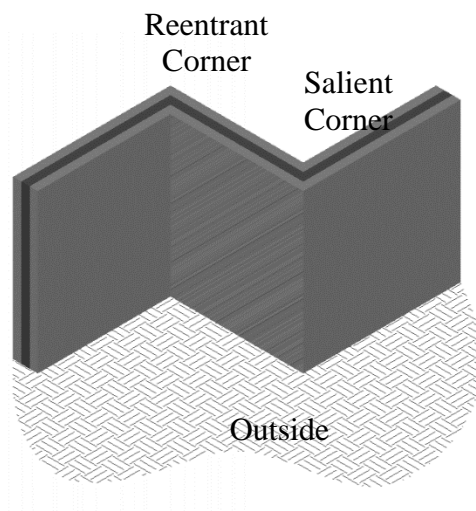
Visual definition of corner types viewing from the outside of a building: Reentrant corner (left, facing into building) and Salient corner (right, facing outward from building)
